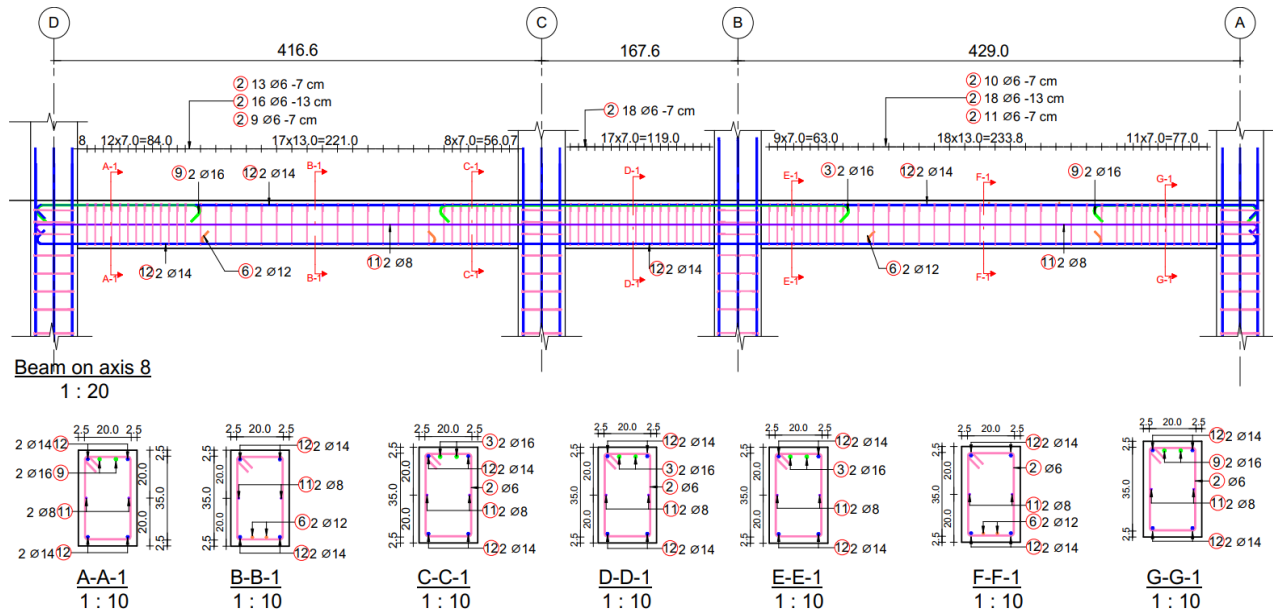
2D steel reinforcement for the beam on axis 8
